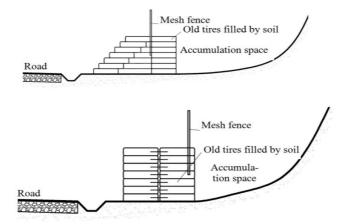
Proposed retaining structure from reinforced soil with old tyres.
